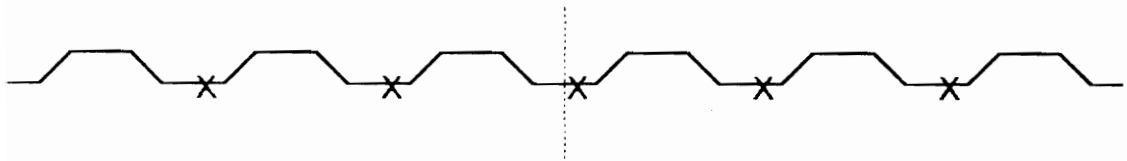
SDI-2/18-5-9 Concrete Strain Gage and Shear Stud Locations
